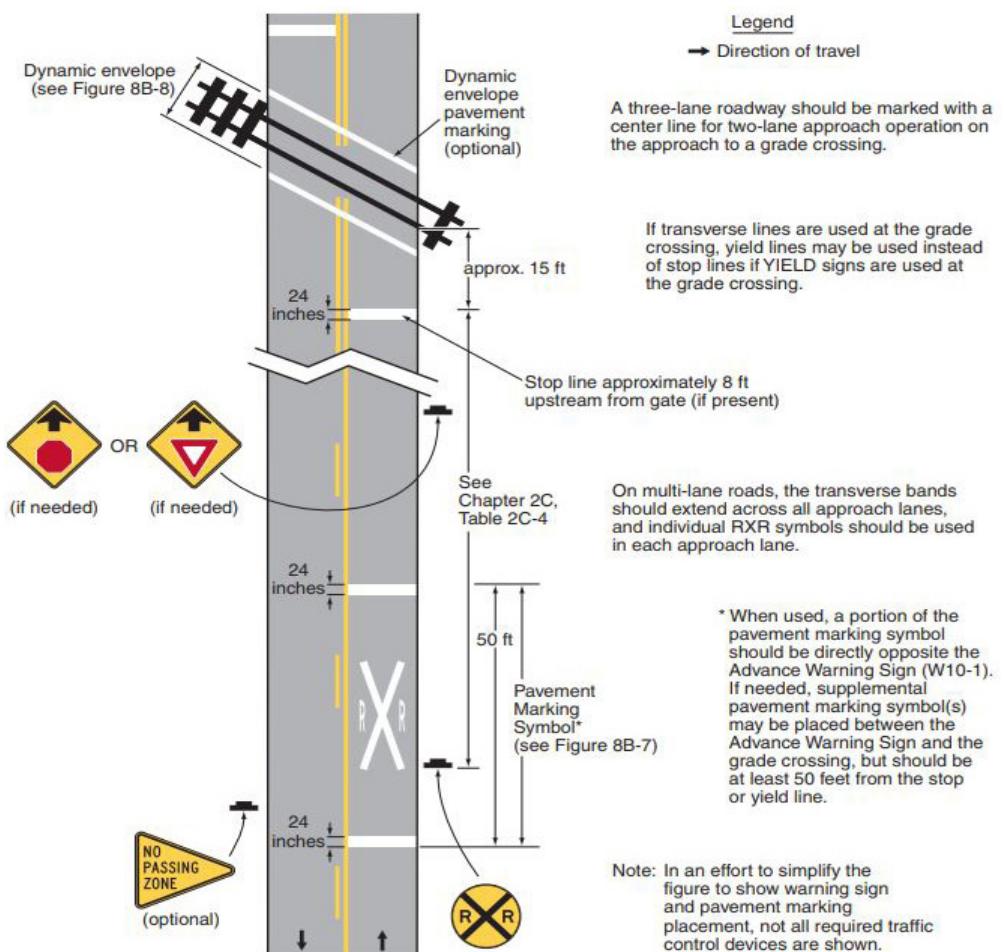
Example of Placement of Warning Signs and Pavement Markings at Highway-Rail Crossings
